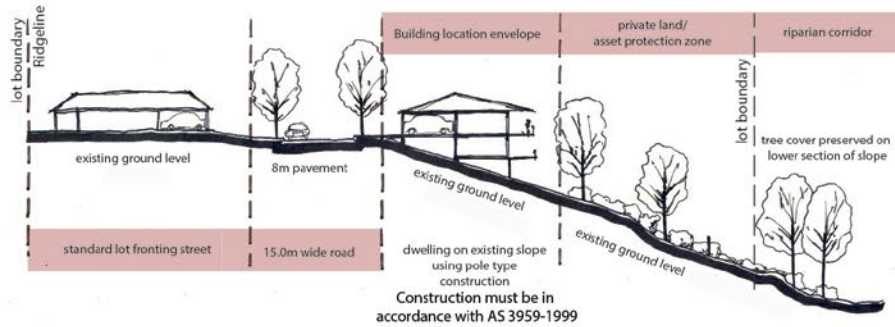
Dwelling Design Principles to Consider on Steep Slopes
